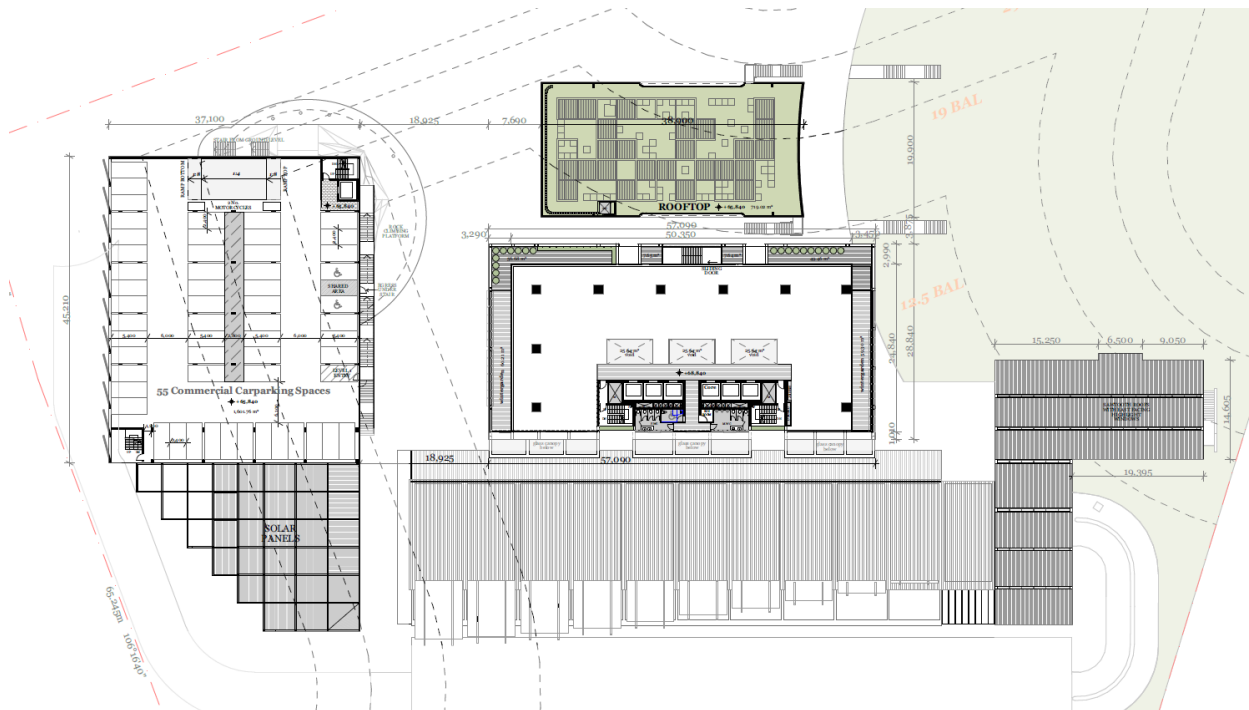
Extract of the proposed level 1 plan (Source: DKO Architecture)
